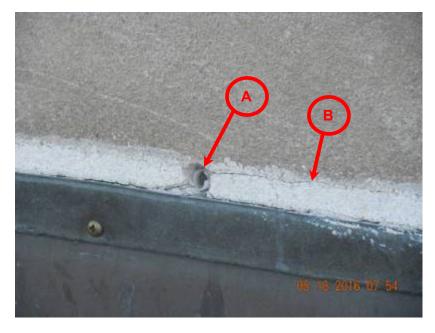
(A) Back-pitched weep hole above gutter at 6^{th} floor, N - P Façades, west elevation. Note deteriorated sealant joint (B).
